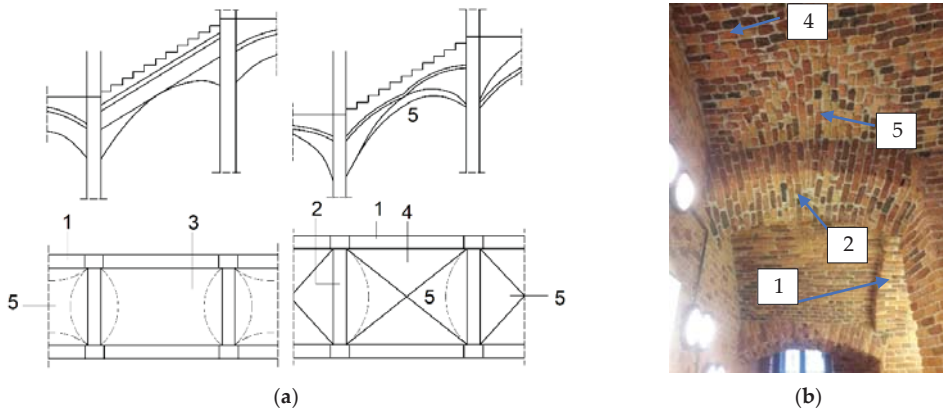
Brick stairs with column supports based on [1]. Scheme (a) and partial photo (b): 1—arched masonry stair sides; 2—arched masonry bolt; 3—barrel staircase with support on sides; 4—groin vault in stair flight; 5—groin or barrel vaults in stair landing.
